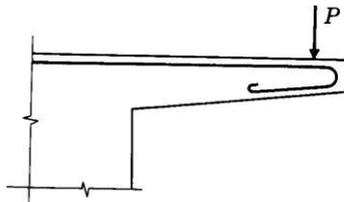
Development of primary reinforcement in cantilever slab subject to large concentrated load at free end
